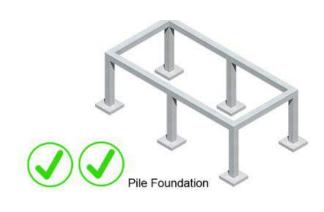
Foundation detail Source: Author Building column design have a function as bracing of the building. And every 4 meters grid repetition to create strong bracing against earthquake forces.
